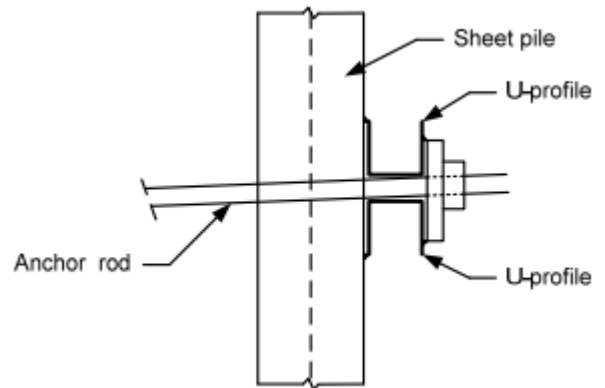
wale with anchor connected to sheet pile 5] (manual hydraulic structures)
